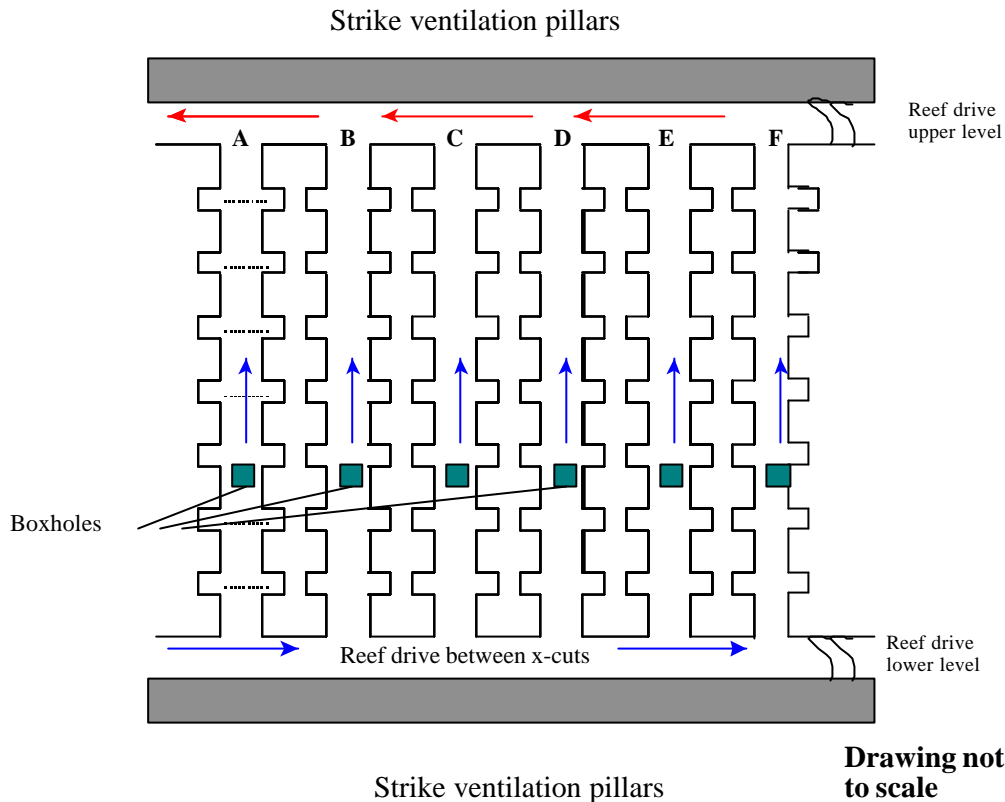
Detailed airflow arrangements in pre-developed wide raises.
